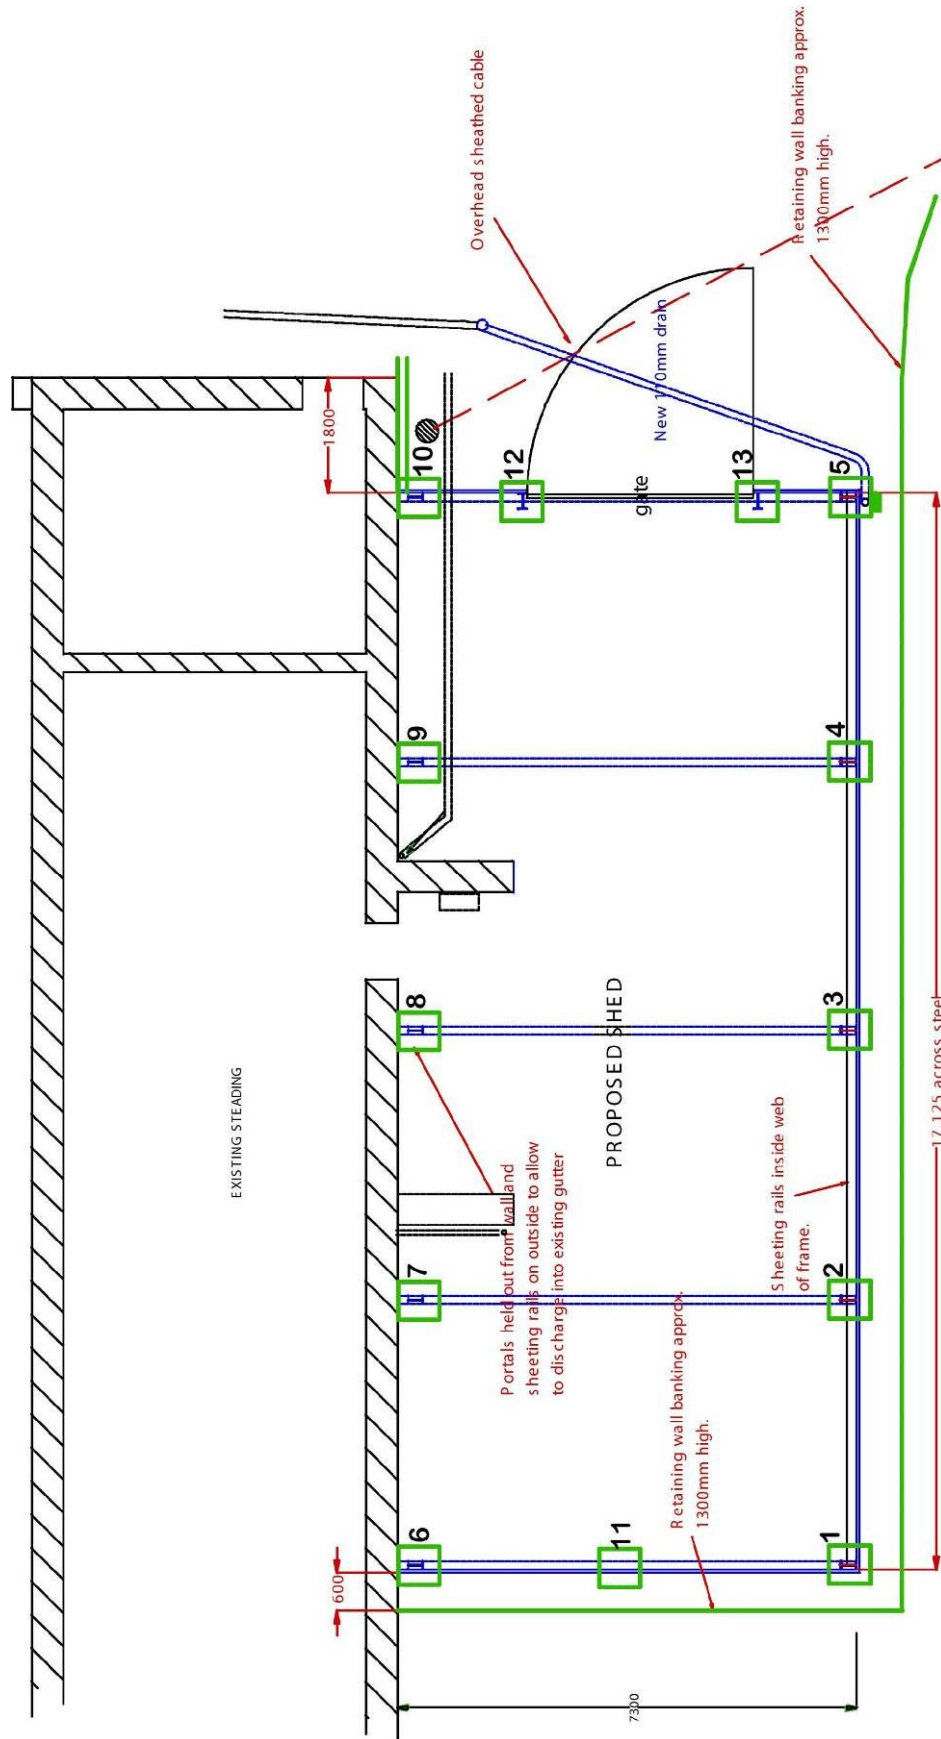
site plan showing pit locations (kindly provided by Buccleuch Rural Solutions)
